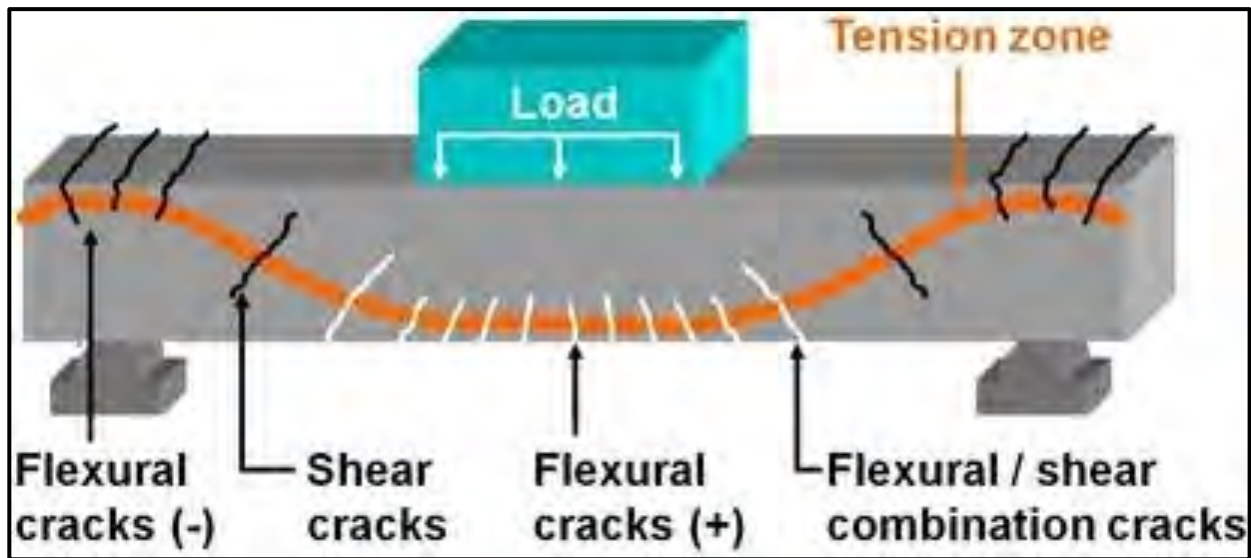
Location and directions of overloading beam cracks²⁹.
